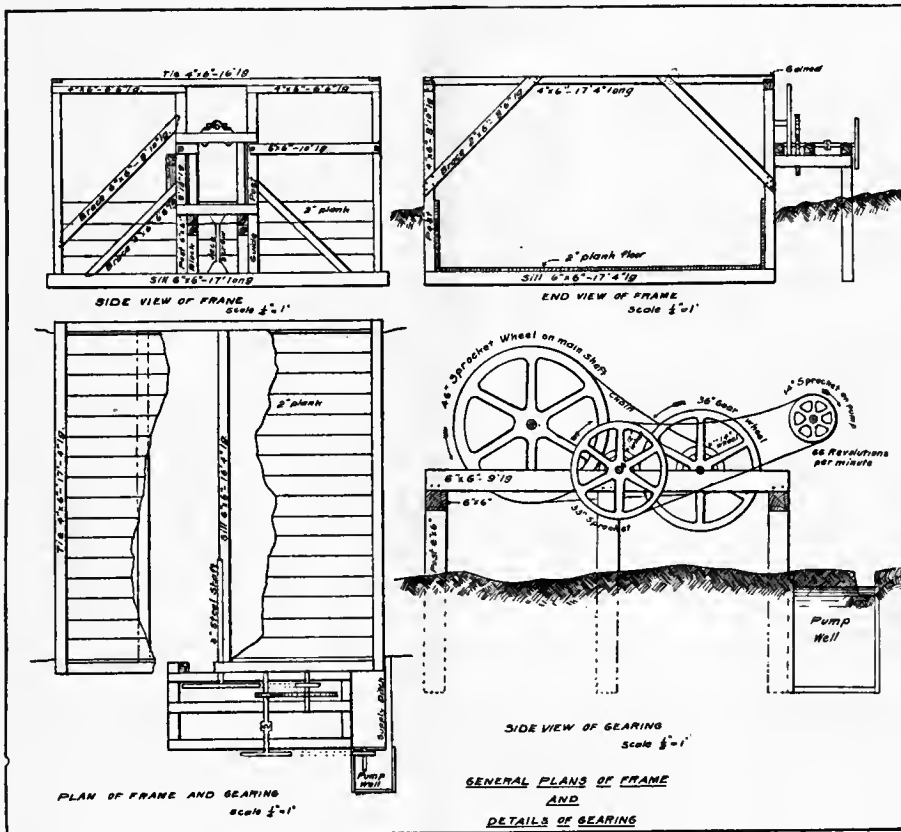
Framing and Gearing for Wheel Shown in Fig. 18.
